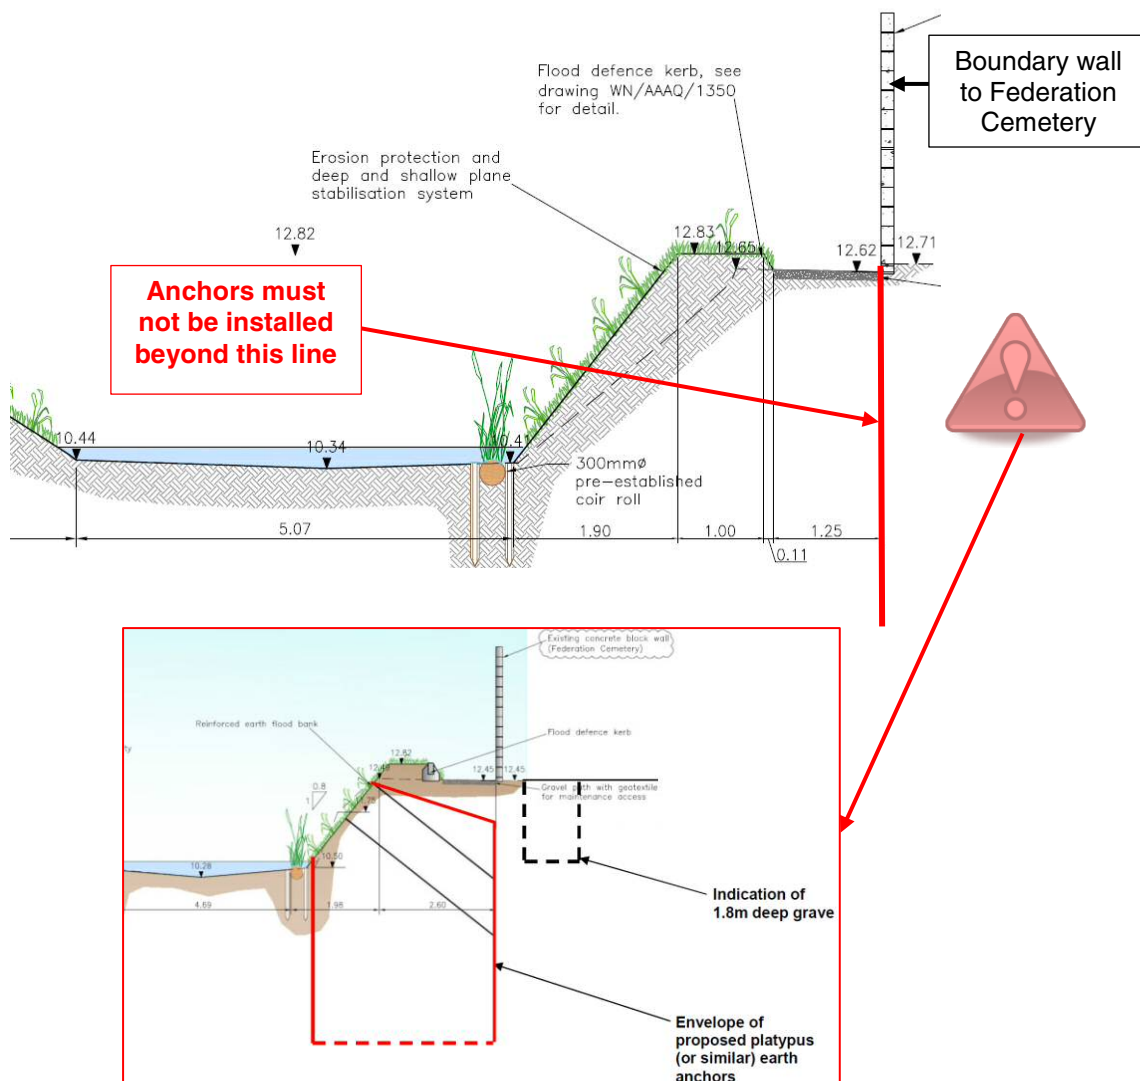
Cross section B-B – Reinforced Flood Bank
